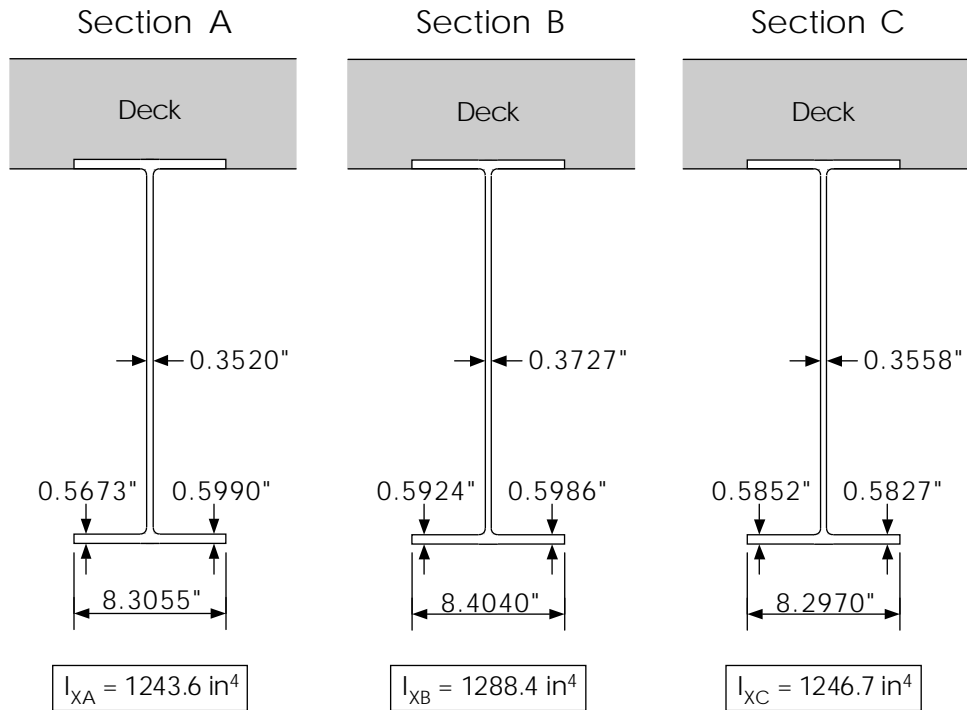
Girder Cross Sections, Showing the As-Measured Section Dimensions and the Calculated Moments of Inertia
